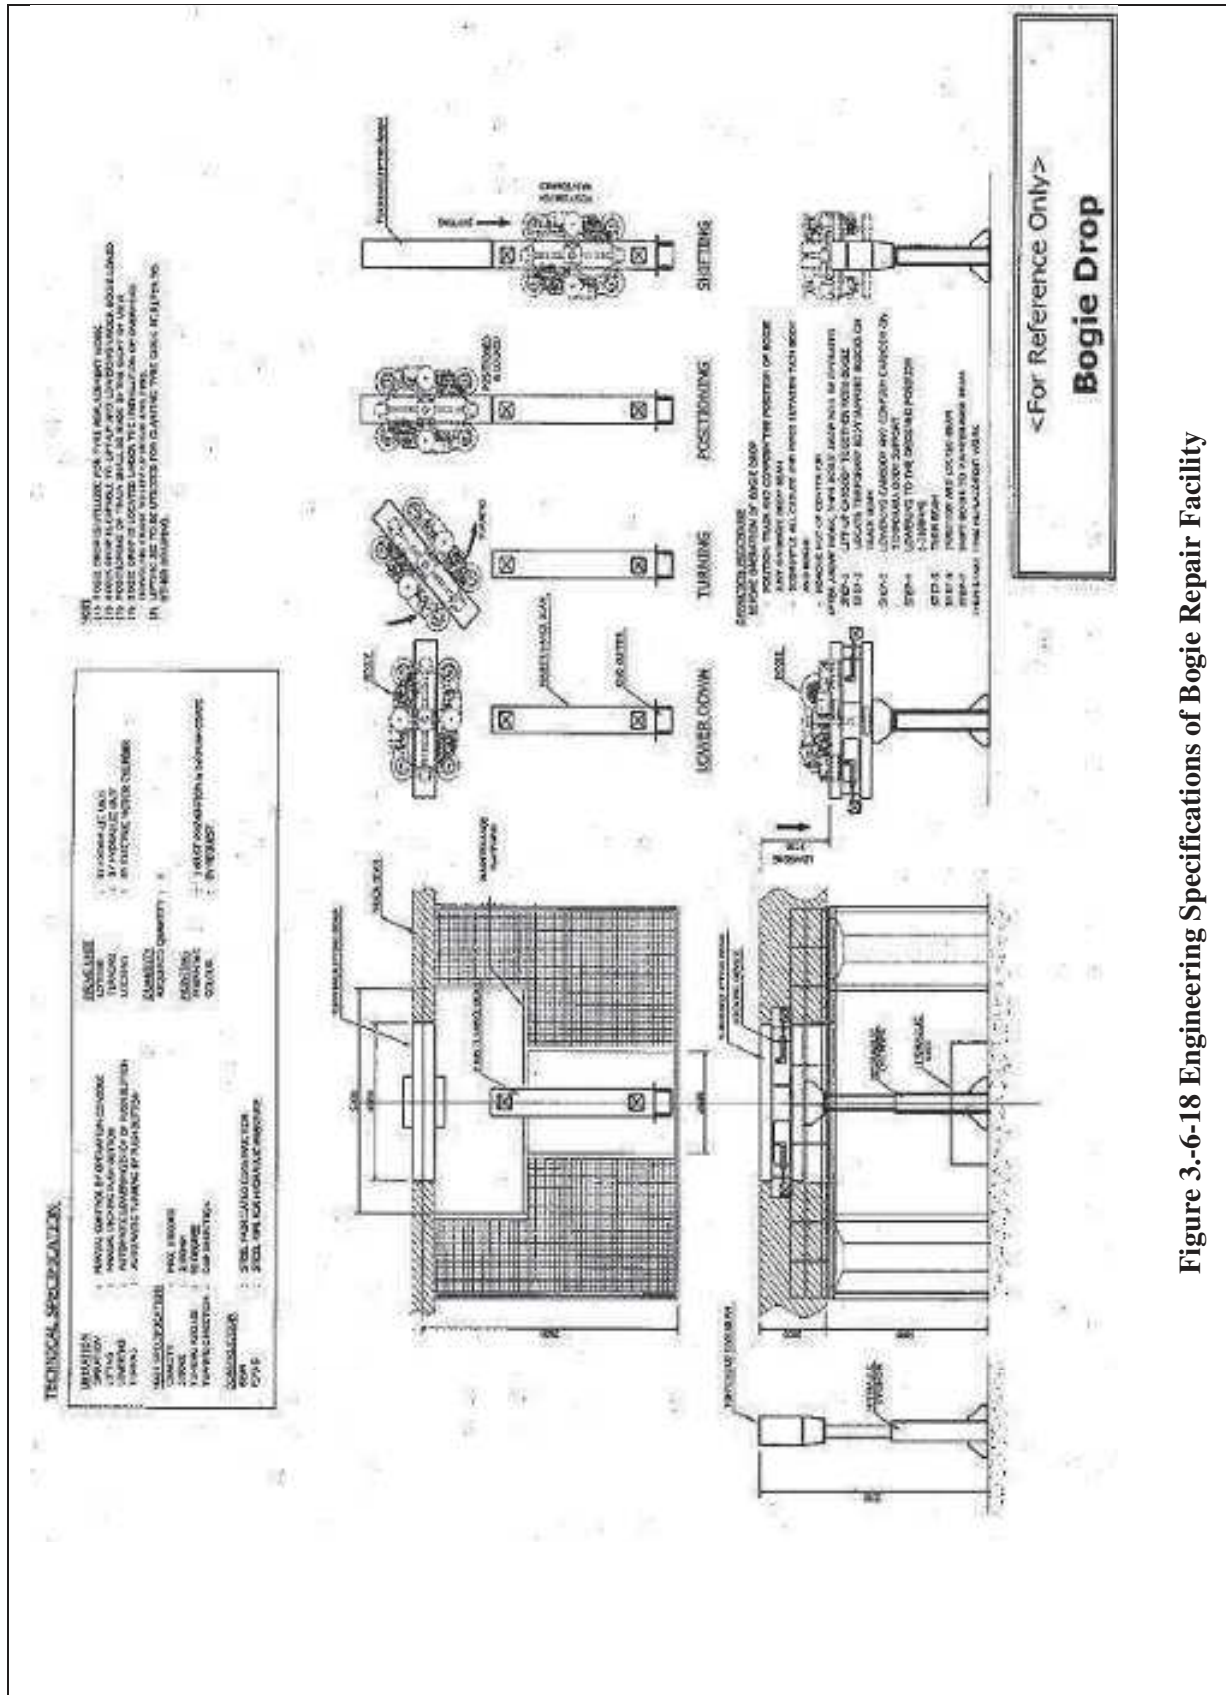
Engineering Specifications of Bogie Repair Facility
